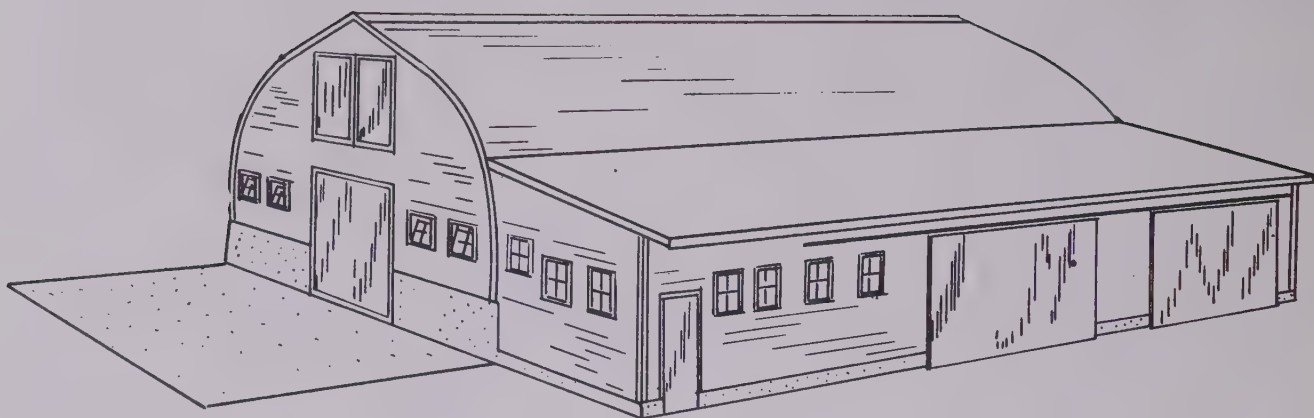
Perspective view of loose-housing barn with milking room and feed storage on one side.
